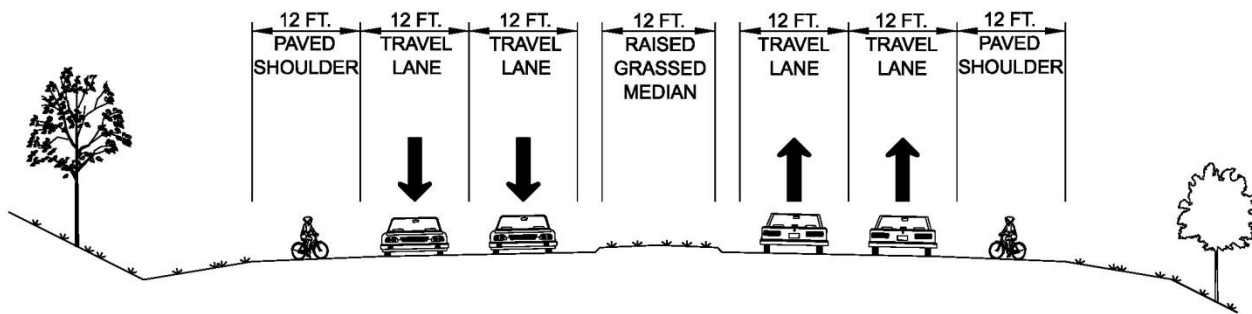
SEGMENT 6 PROPOSED TYPICAL SECTION
